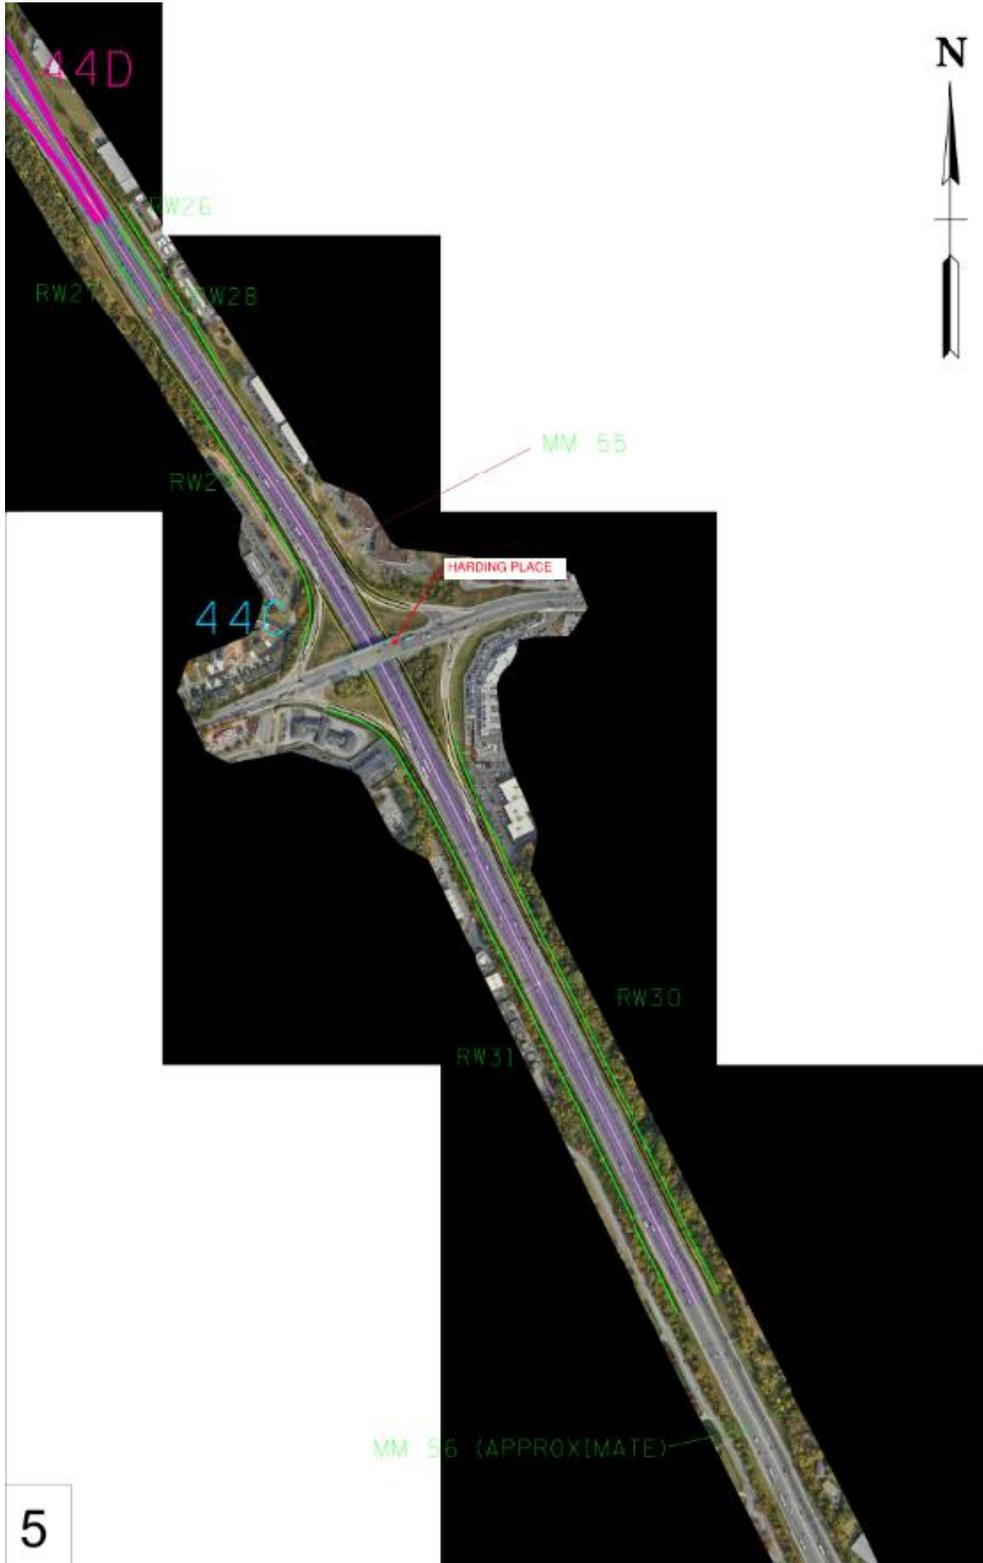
Alternative 1, Bridge and Retaining Wall Locations, East Thompson Ln to Antioch Pike
